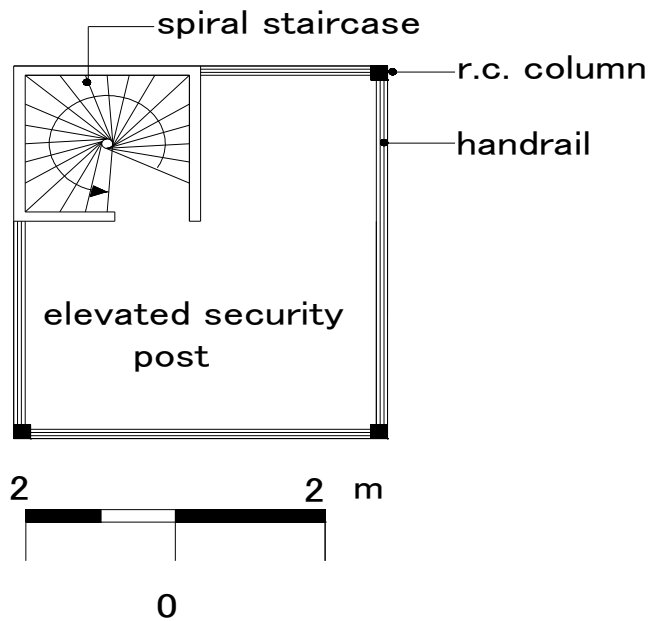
Upper Floor Plan of Elevated Security monitoring Post. Source: author's design
